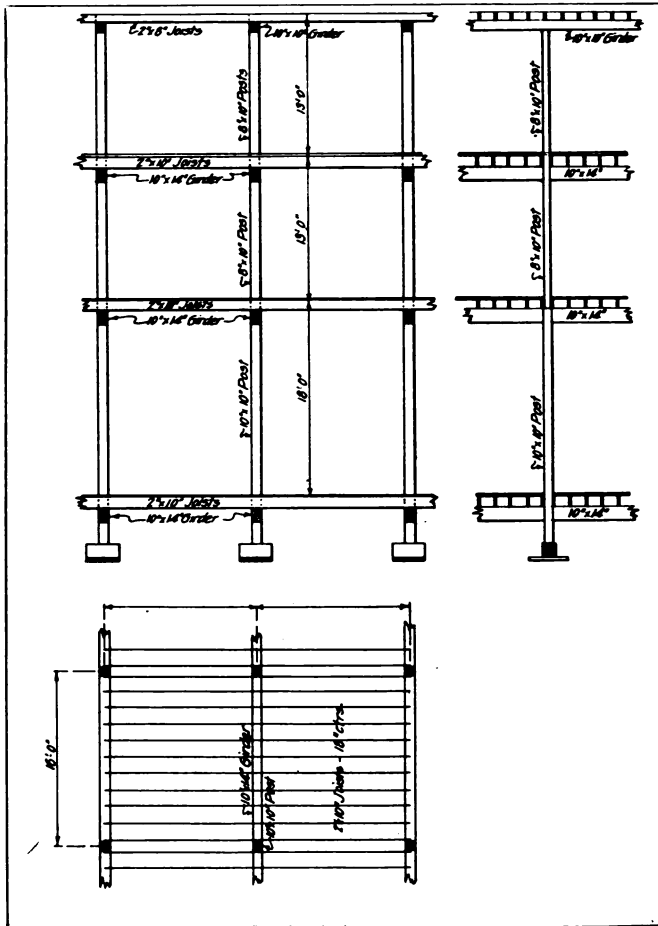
TYPICAL TIMBER-FRAMED BUILDING.
